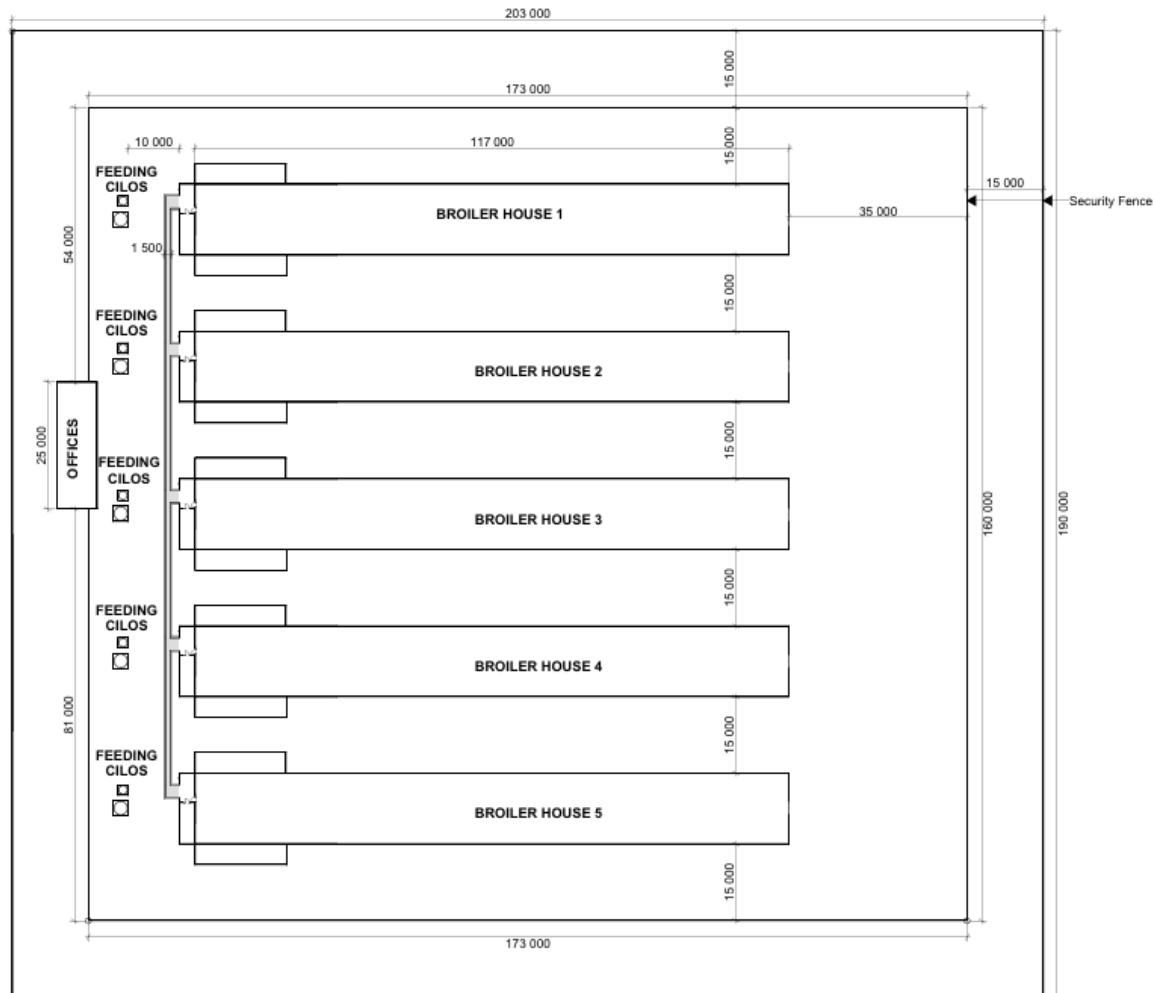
Typical Broiler House Layout (Just-Us Architecture, 2026)
